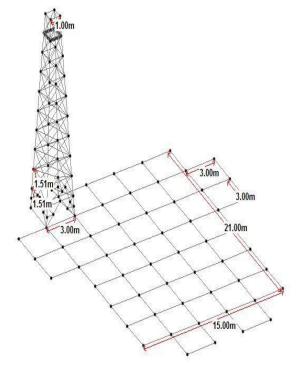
Case A of Telecommunication Tower Over Roof of Position P1
